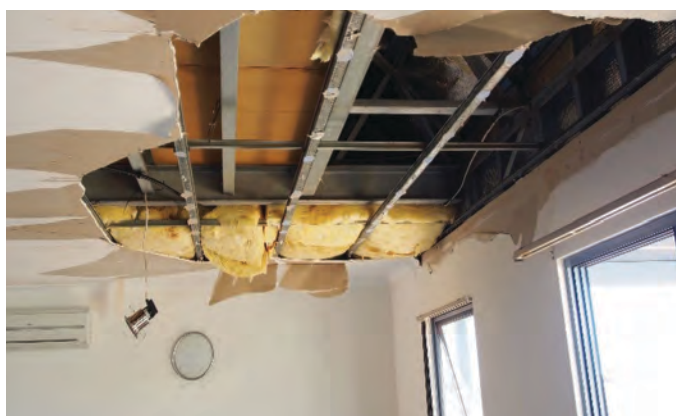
CTS photos—extensive water ingress damage to internal cladding of modern buildings.
